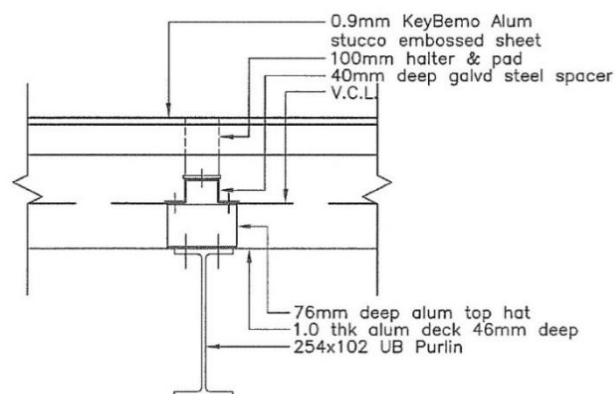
c. Section A-A through as-built roof (i.e. at 90 degrees to last section).
